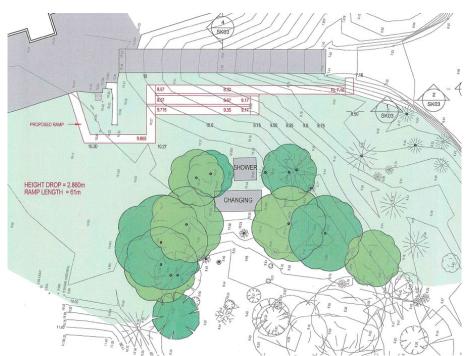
Option 2 Concept Plan - Southern Side of Concrete Ramp
